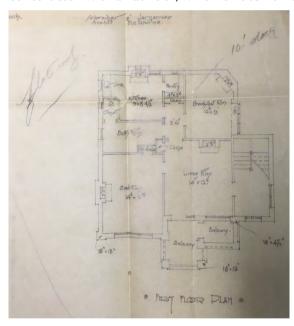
Extract of original building plans showing the first-floor layout with 'flat roof' notation upper level (Source: Council building file).
